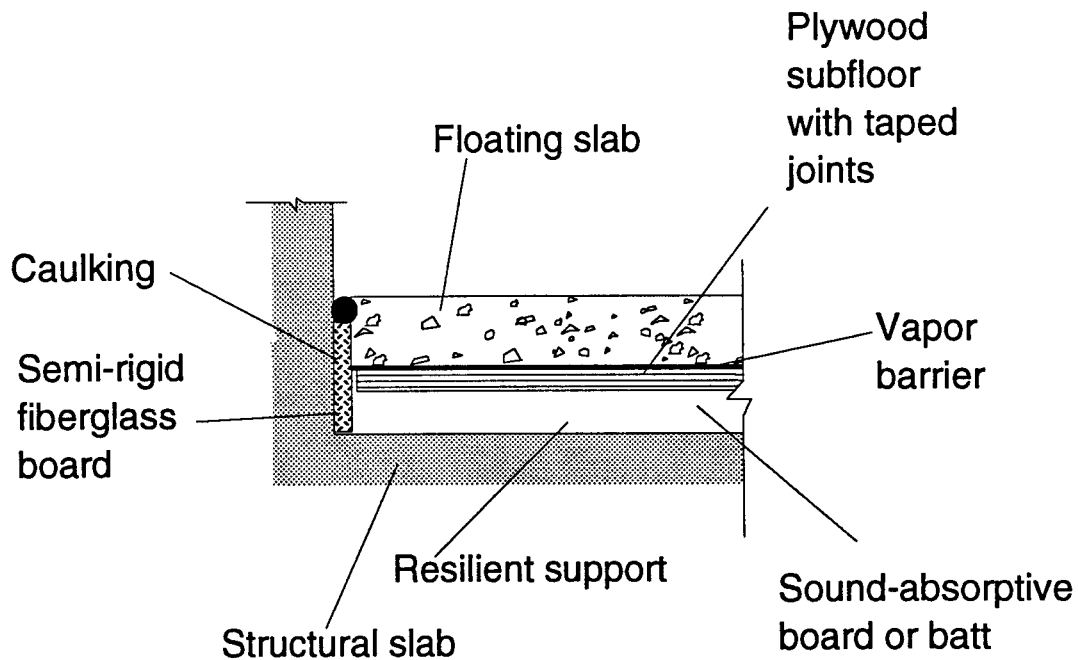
Example of concrete floating floor supported on resilient pads. The floating slab should not be in contact with the main building structure nor the structural slab below.
